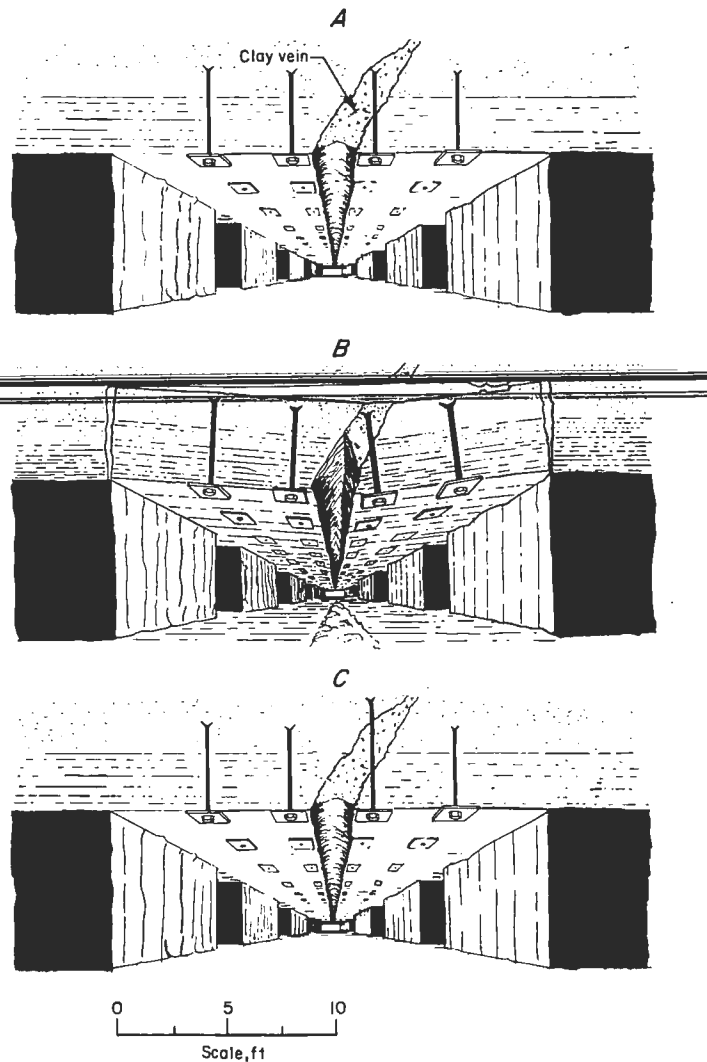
Clay vein bolting diagram. A, clay vein ineffectively bolted; B, roof behaving as independent cantilever beams; C, beam built by using longer roof bolt.
